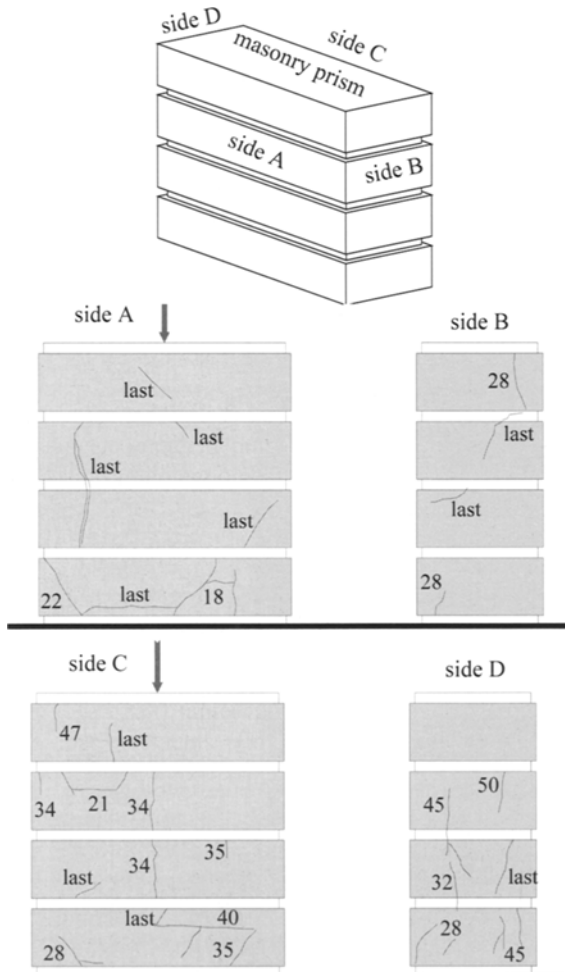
Crack pattern for concentric loading – the numbers indicate the load step at which the crack was detected.
